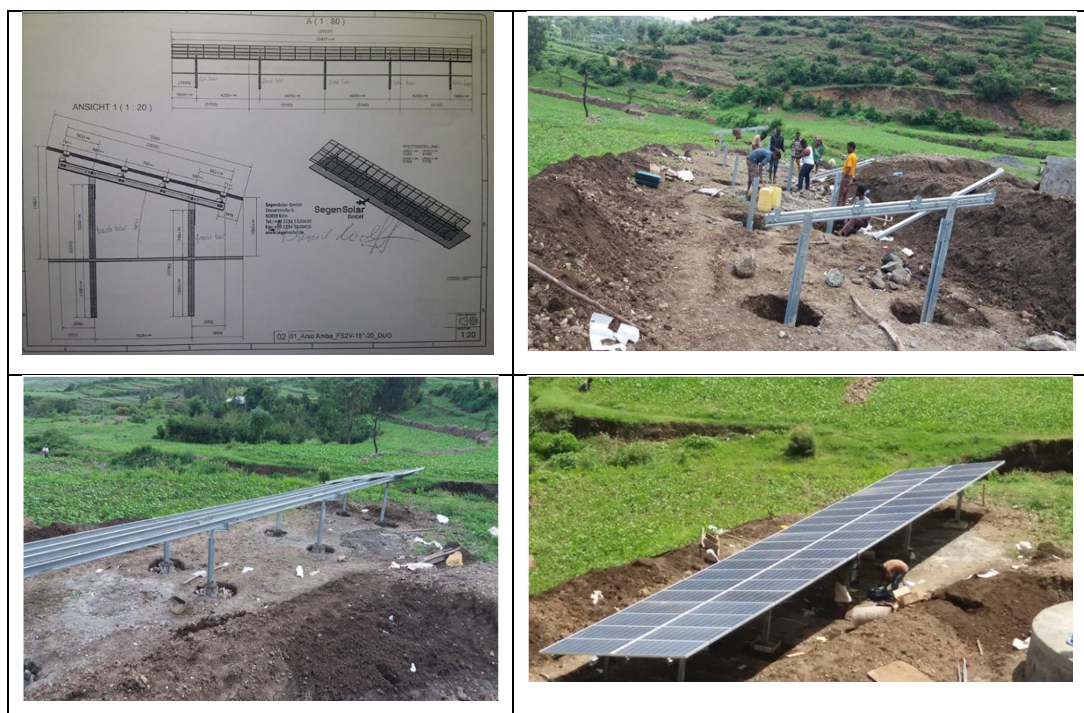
Ground Mount, from design to final installation (SEF/water pump installation)
